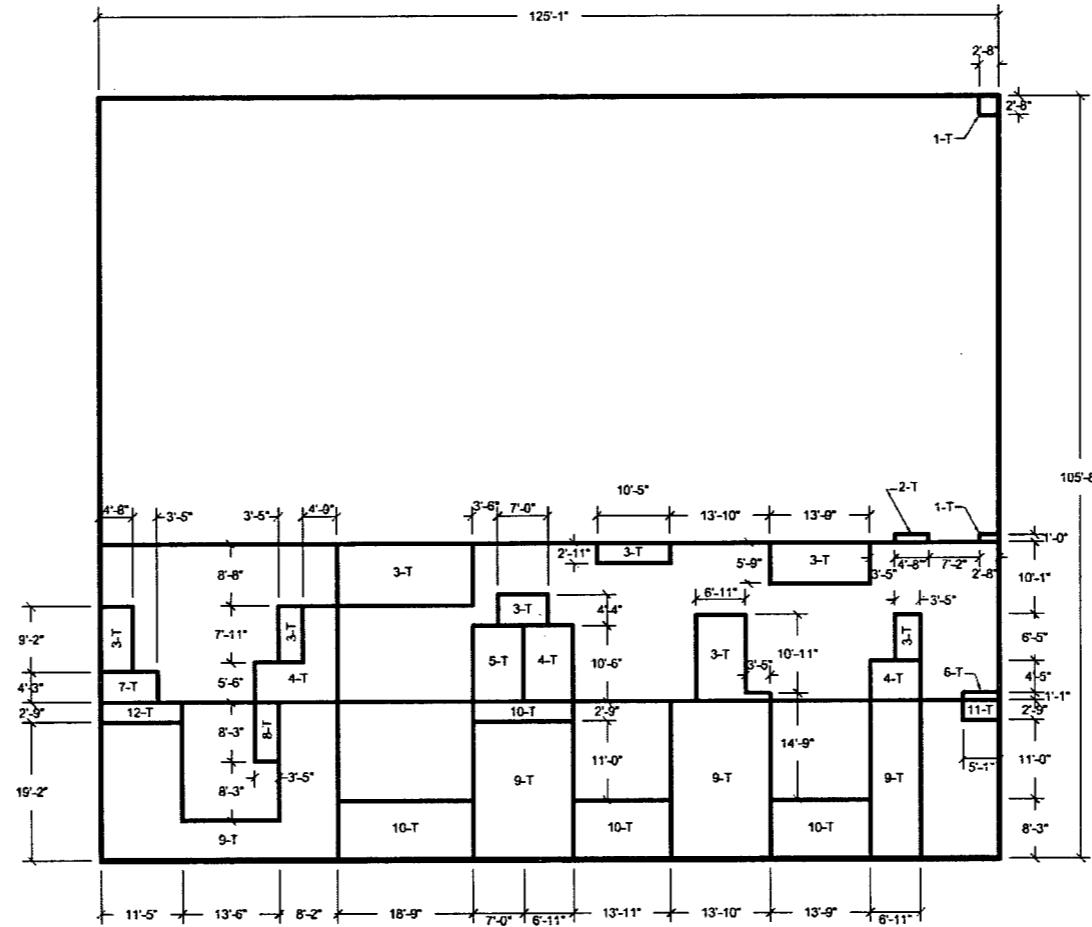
H.3-27: WEST WALL LOOKING EAST
